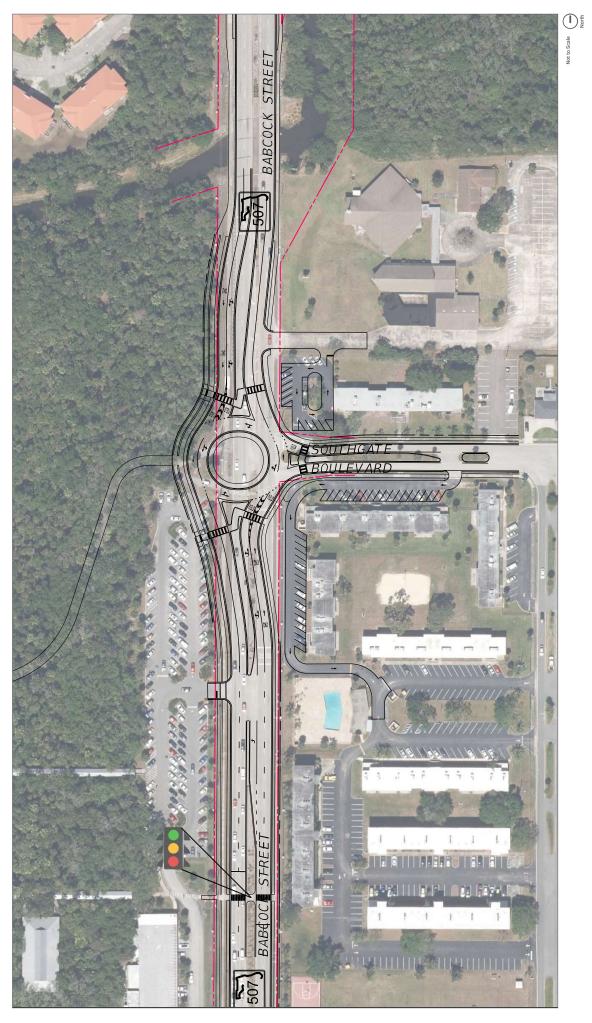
| Babcock Street at Southgate Boulevard Roundabout Concept
